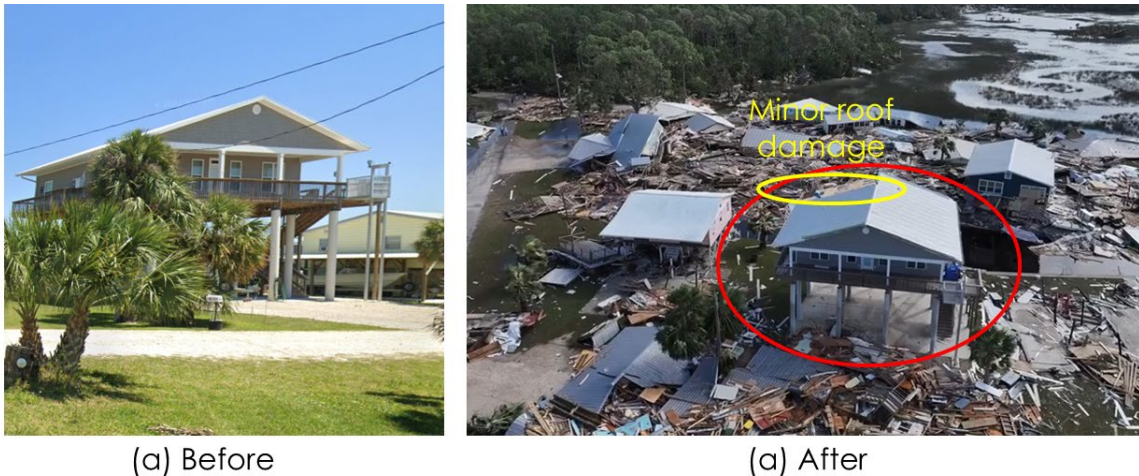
Elevated structure in Dekle Beach, FL, with minor roof damage (Source: [Paul Ratje](#)).
